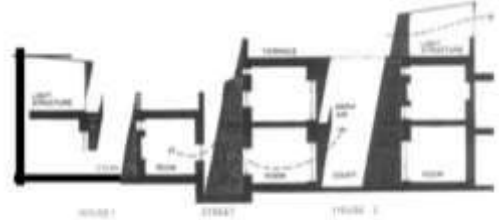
Typical section of homes in Shahjahanabad. A lightweight structure is built above the huge main building. (Source author)
